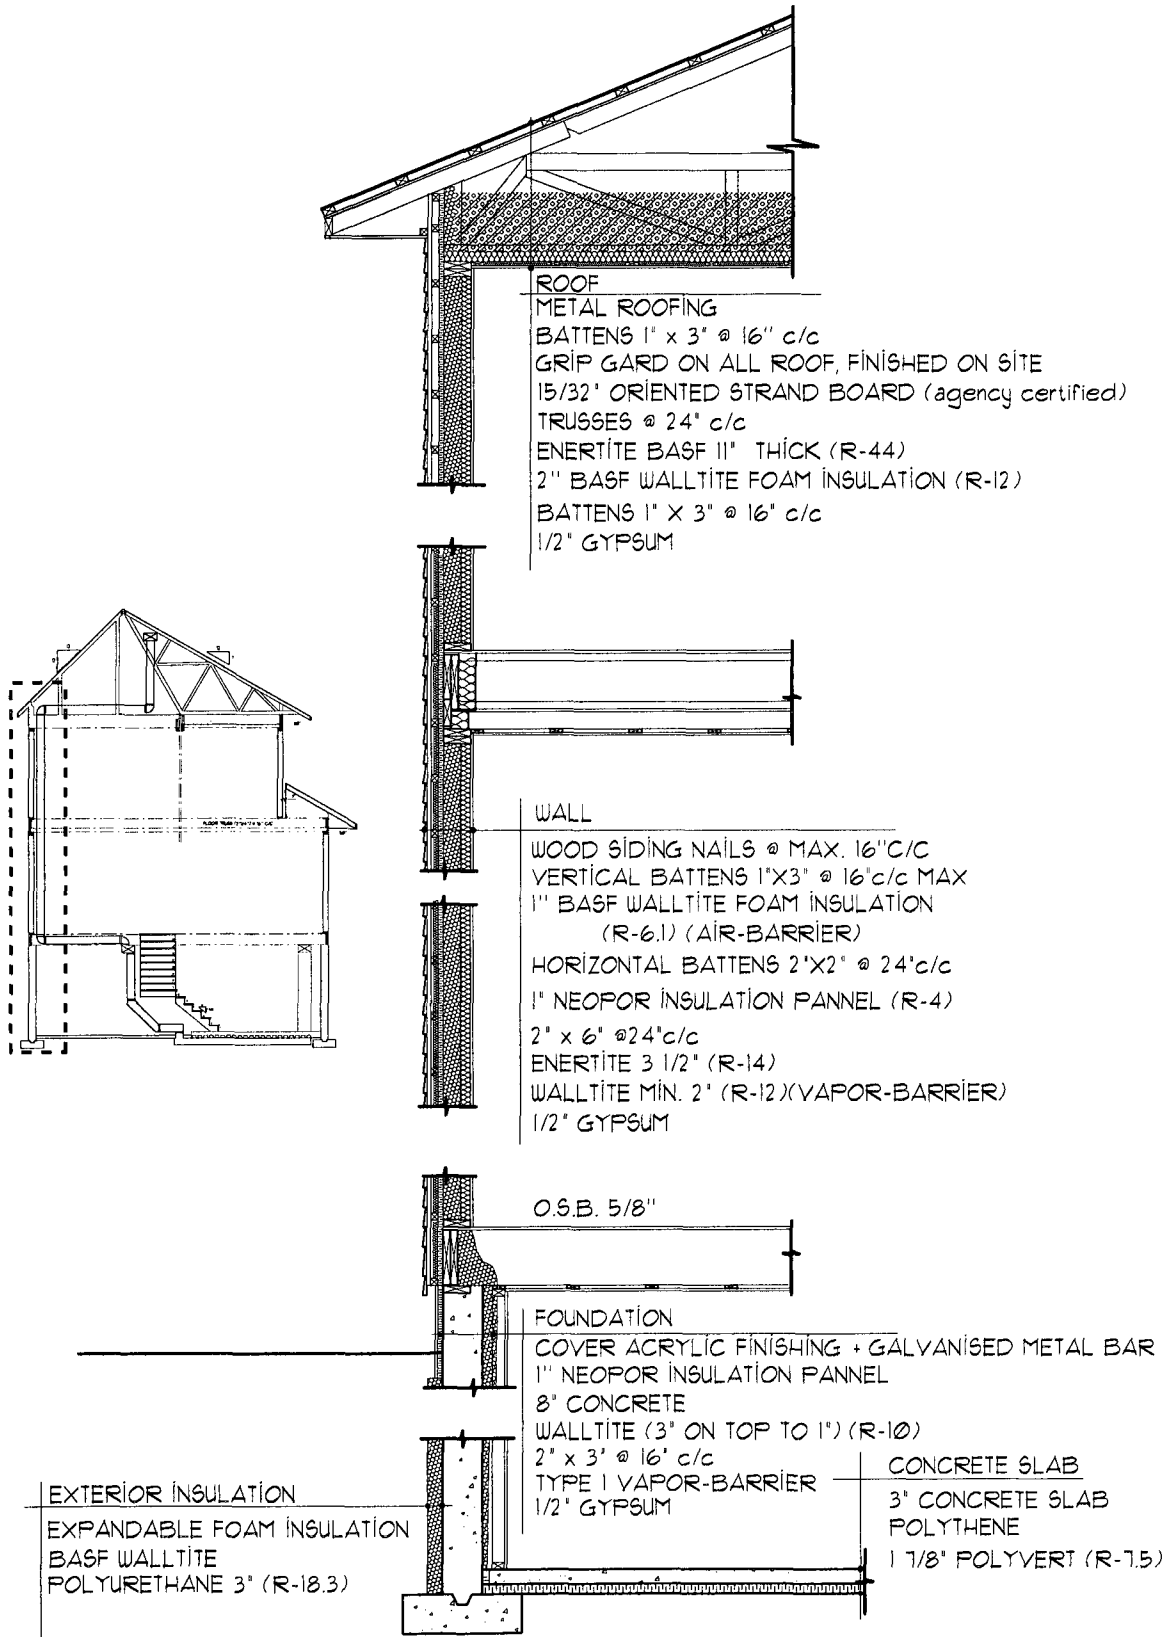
Cross section of the north wall (courtesy of Alouette Homes)
